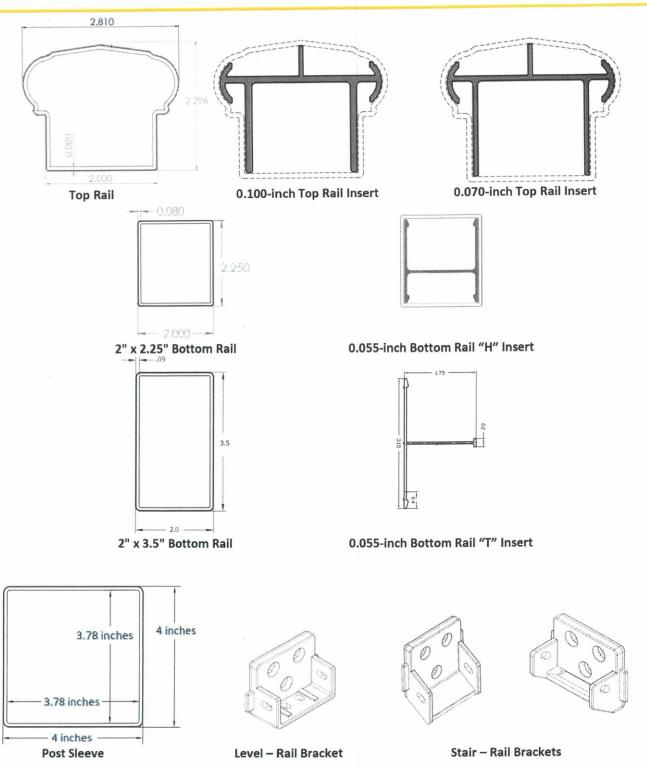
600 SERIES PVC RAILING PROFILES AND BRACKETS
